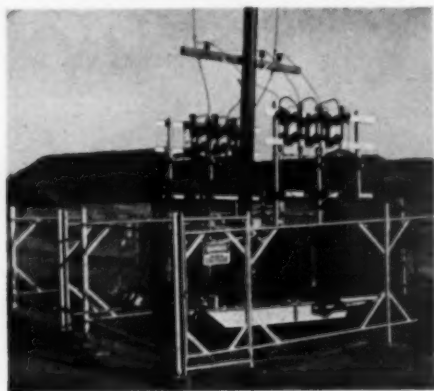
Installation of two 150-kva 4160-480-v drill substations.
